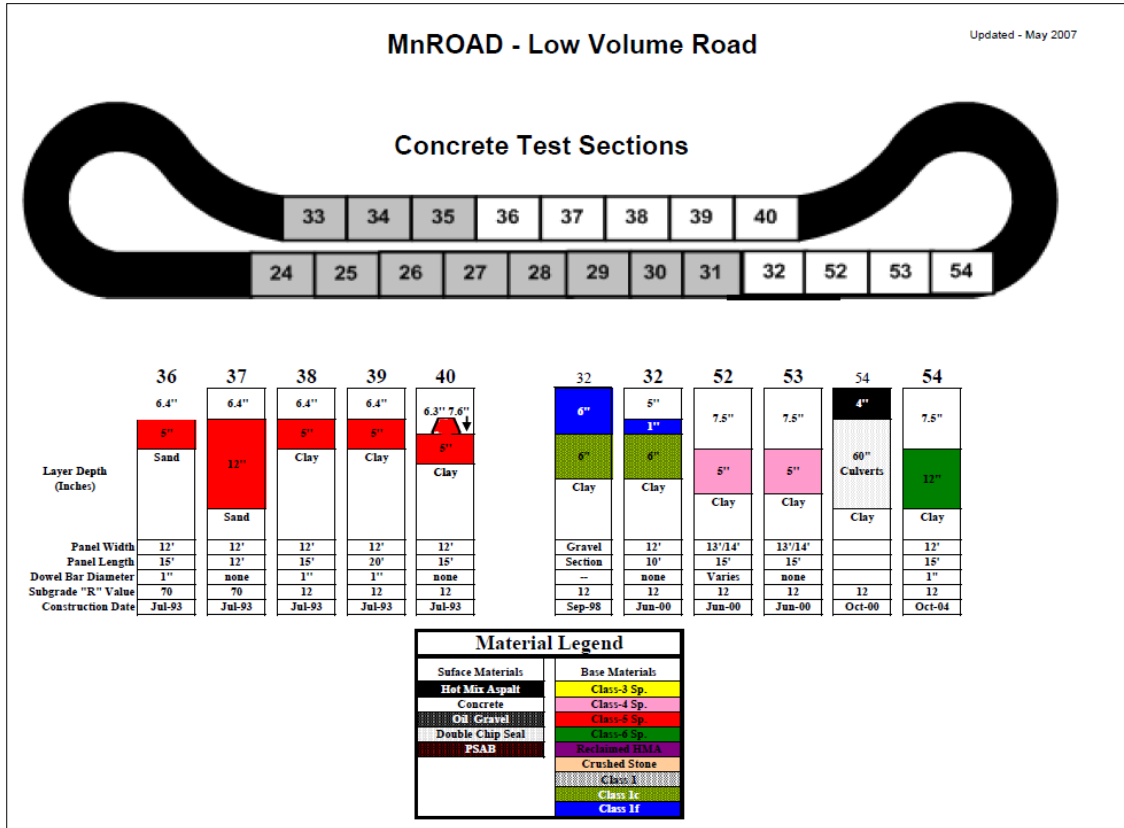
Cross Section and Plan View of Cell 32 and Cell 54
